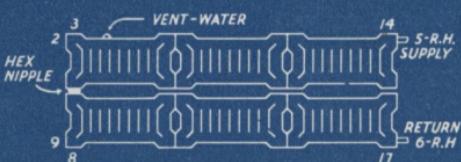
Assembled in single tier. Water or one and two pipe steam.
